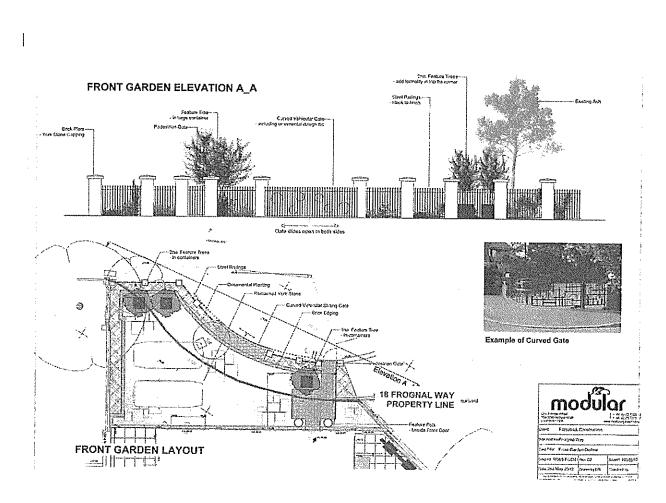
Applicant's proposed landscape layout in front of house, with property boundary superimposed
